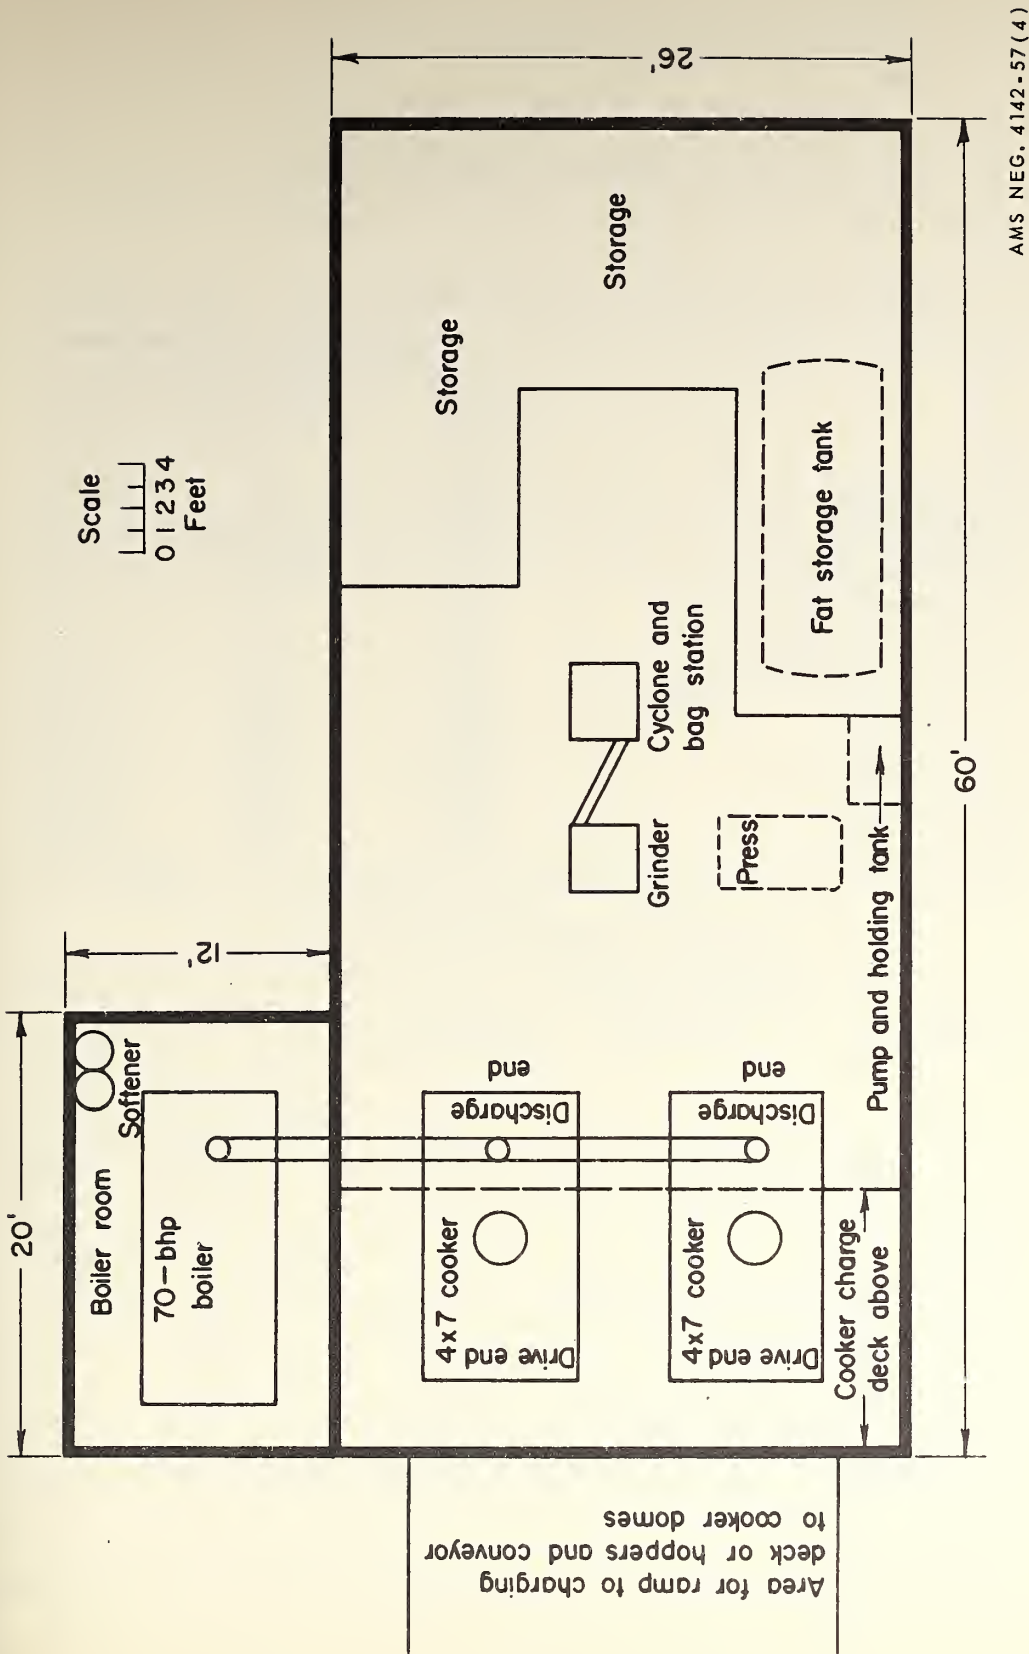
SAMPLE LAYOUT FOR PLANT B AND PLANT C
